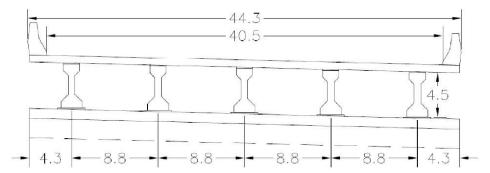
Cross-sectional view of Bridge deck and girders (All dimensions are in feet).
